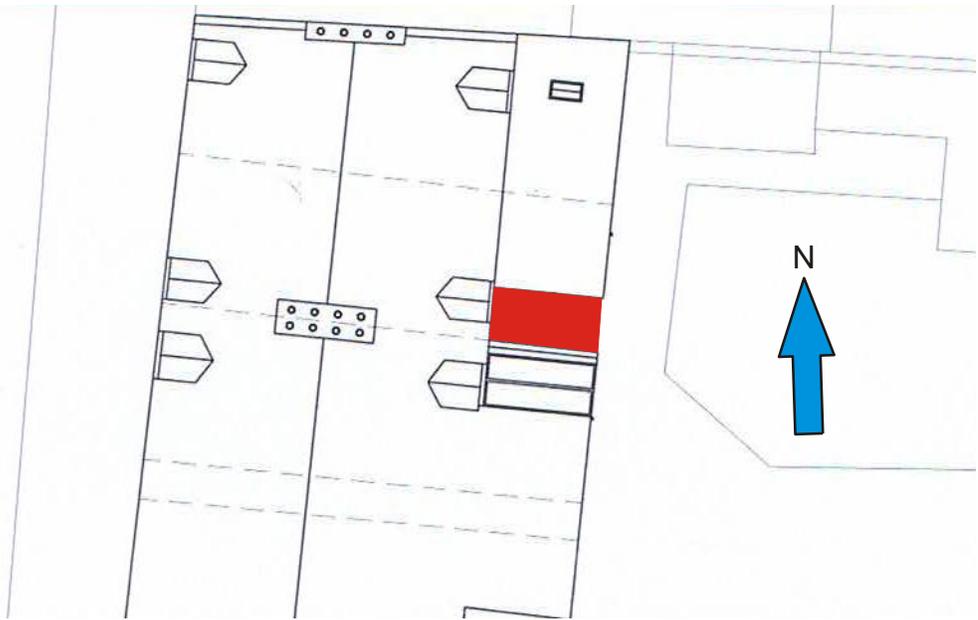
Block plans showing the site location and the proposed layout of the development site at scale of 1:200, (extracts from Architects plans)
